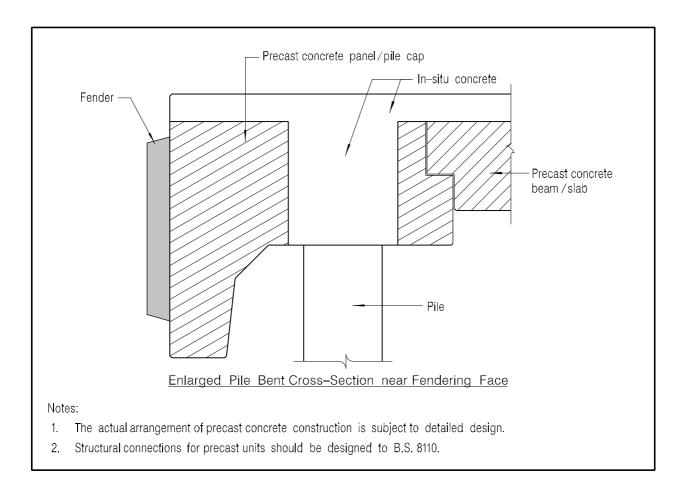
Precast Concrete Construction for Piled Deck Pier
